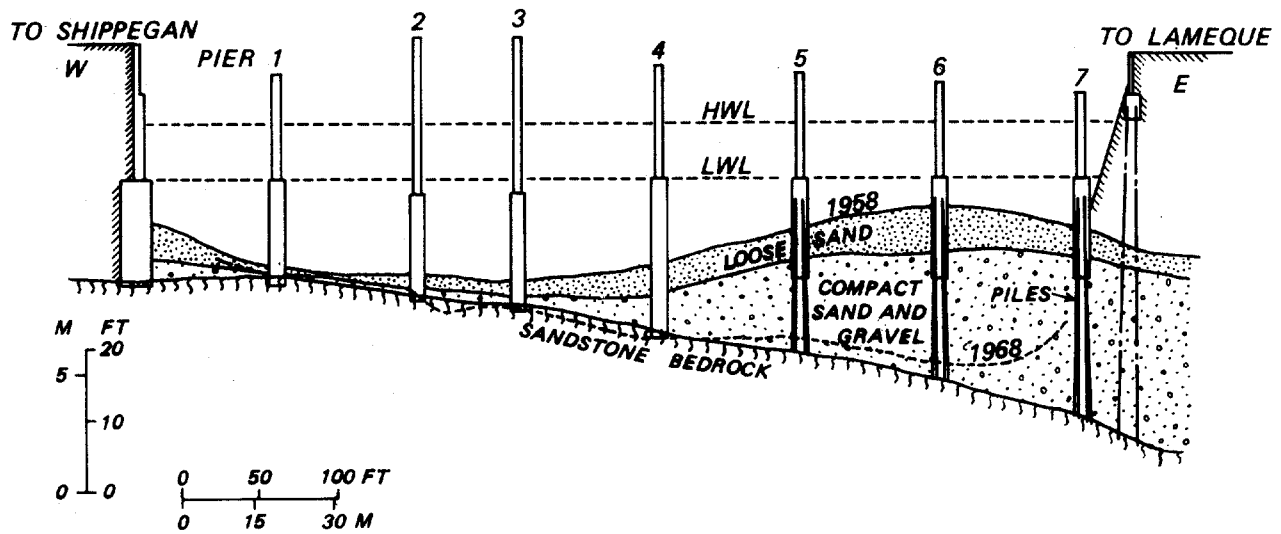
Cross section showing scour at Lameque-Shippegan bridge.
